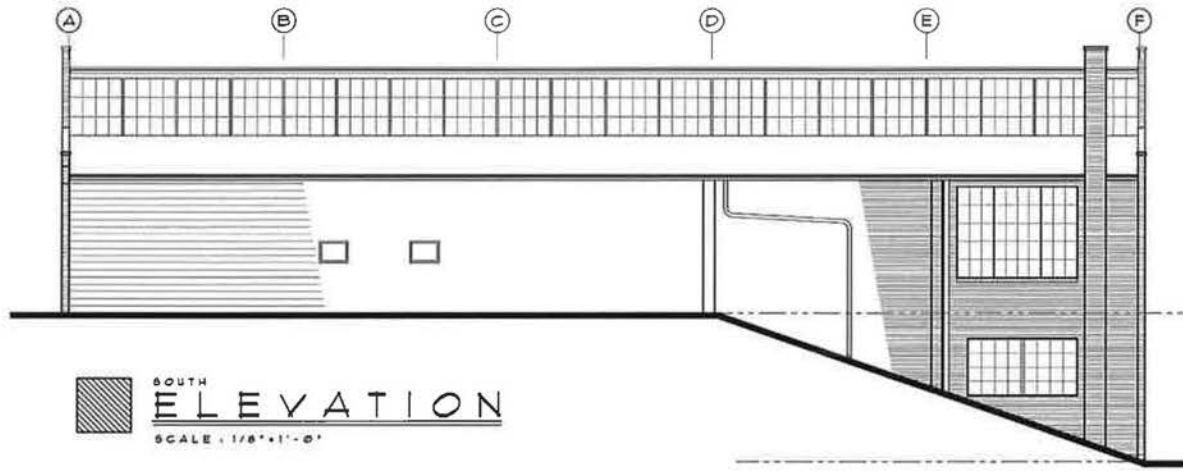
EXISTING CONDITIONS ELEVATIONS
